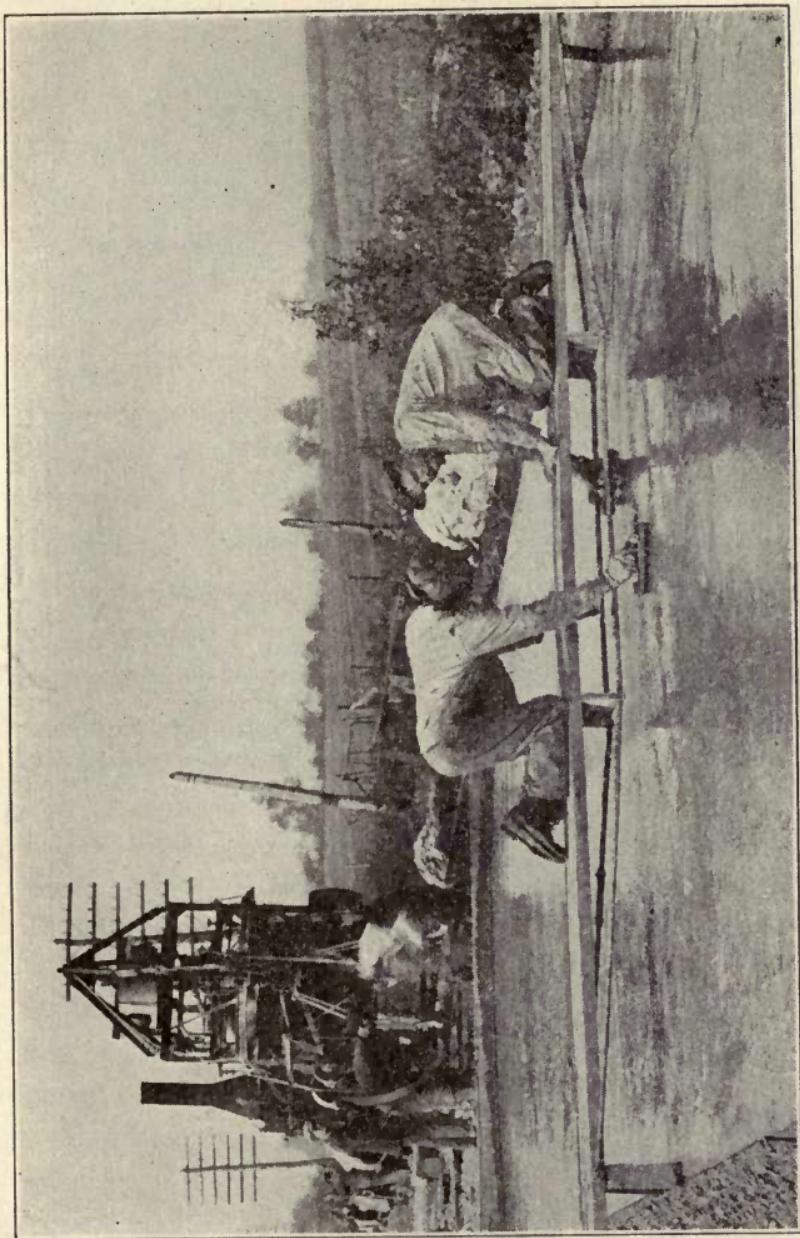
Finishing the surface of concrete road. Mixer in background.
